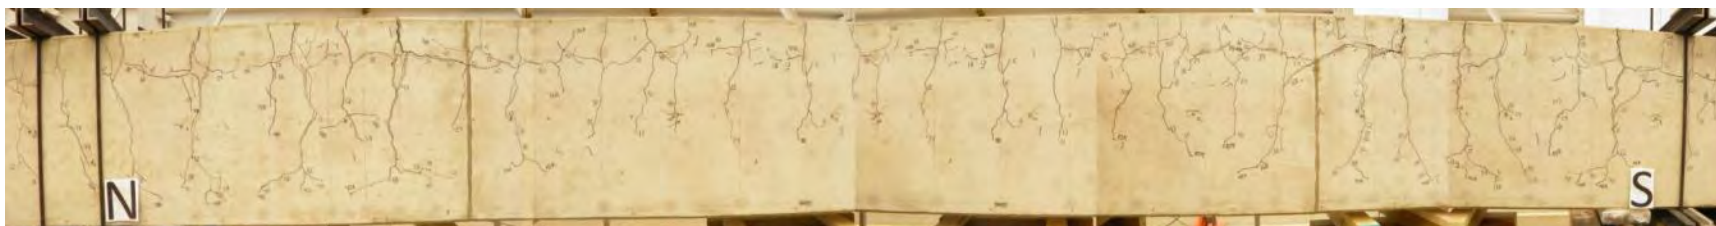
West Elevation of Test Girder A4 Reloaded to 42 kip
